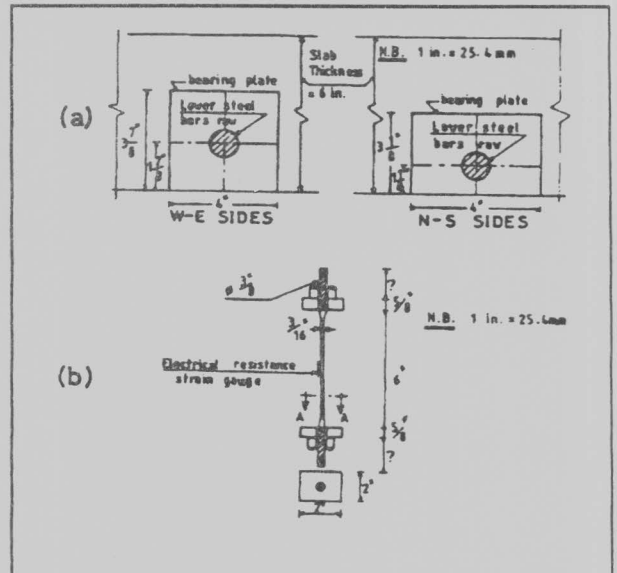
(a). End anchorage bearing plates and position of reinforcement for connection R, (b) Crack detector measuring device.
